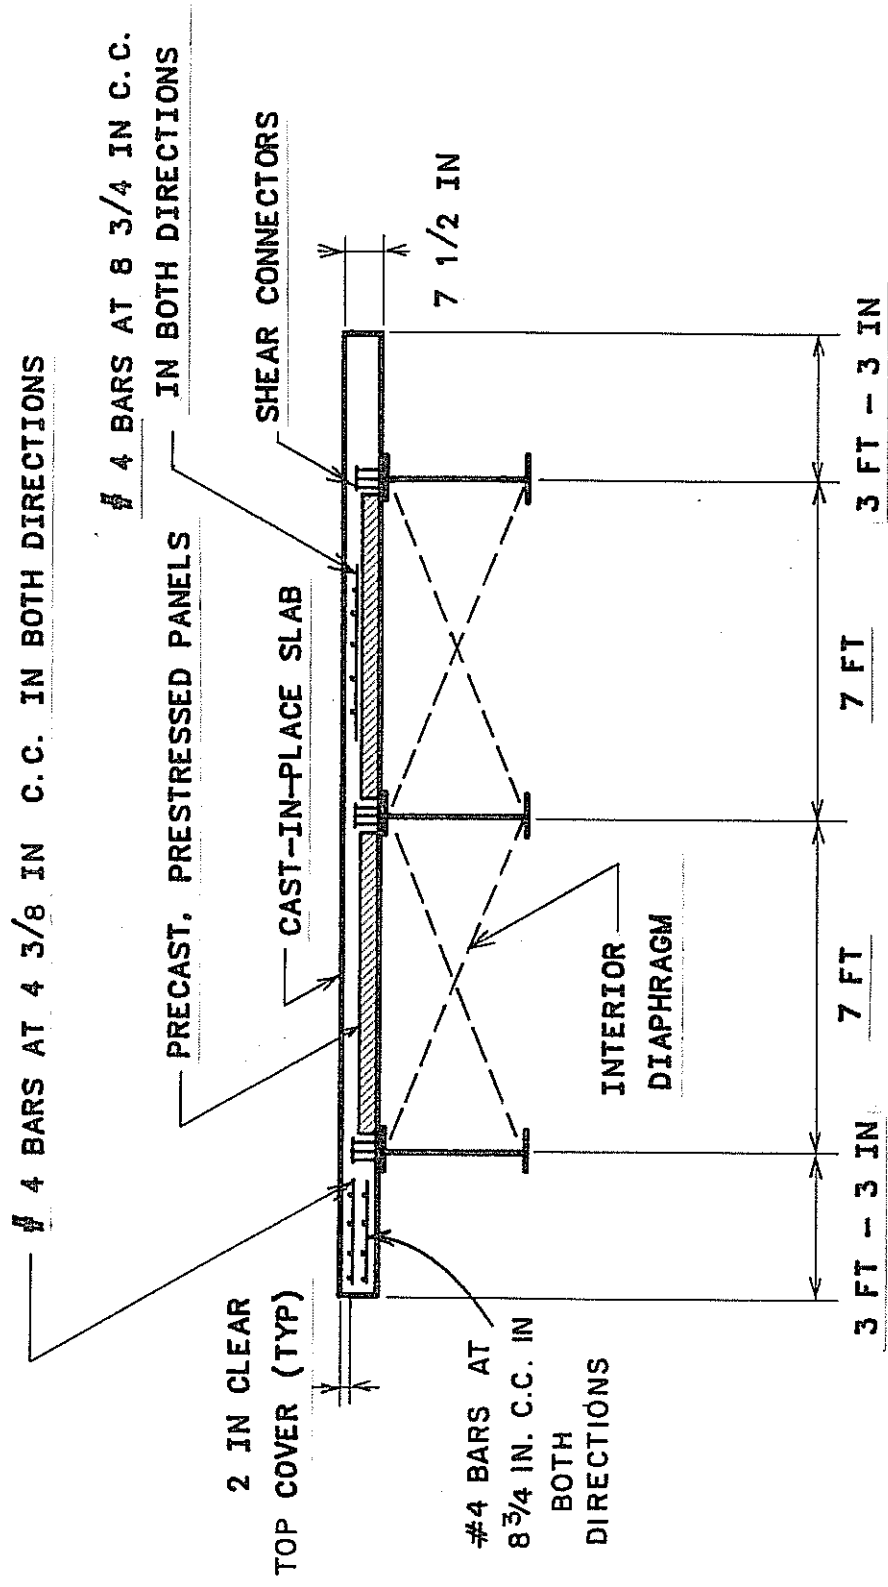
Cross section of laboratory specimen showing precast, prestressed panels
